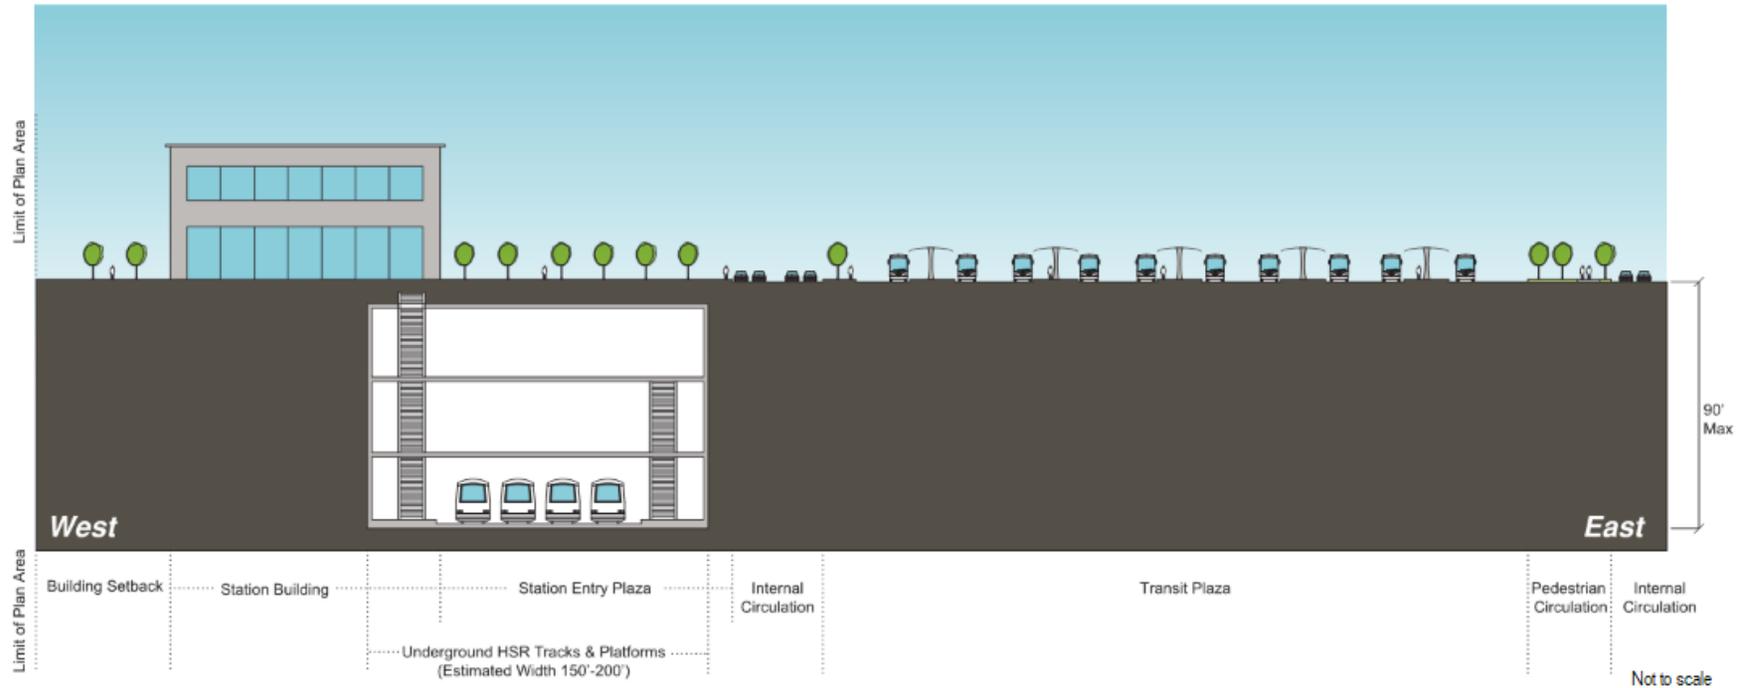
Preliminary Station Concept Layout Plan—Burbank Airport Station
